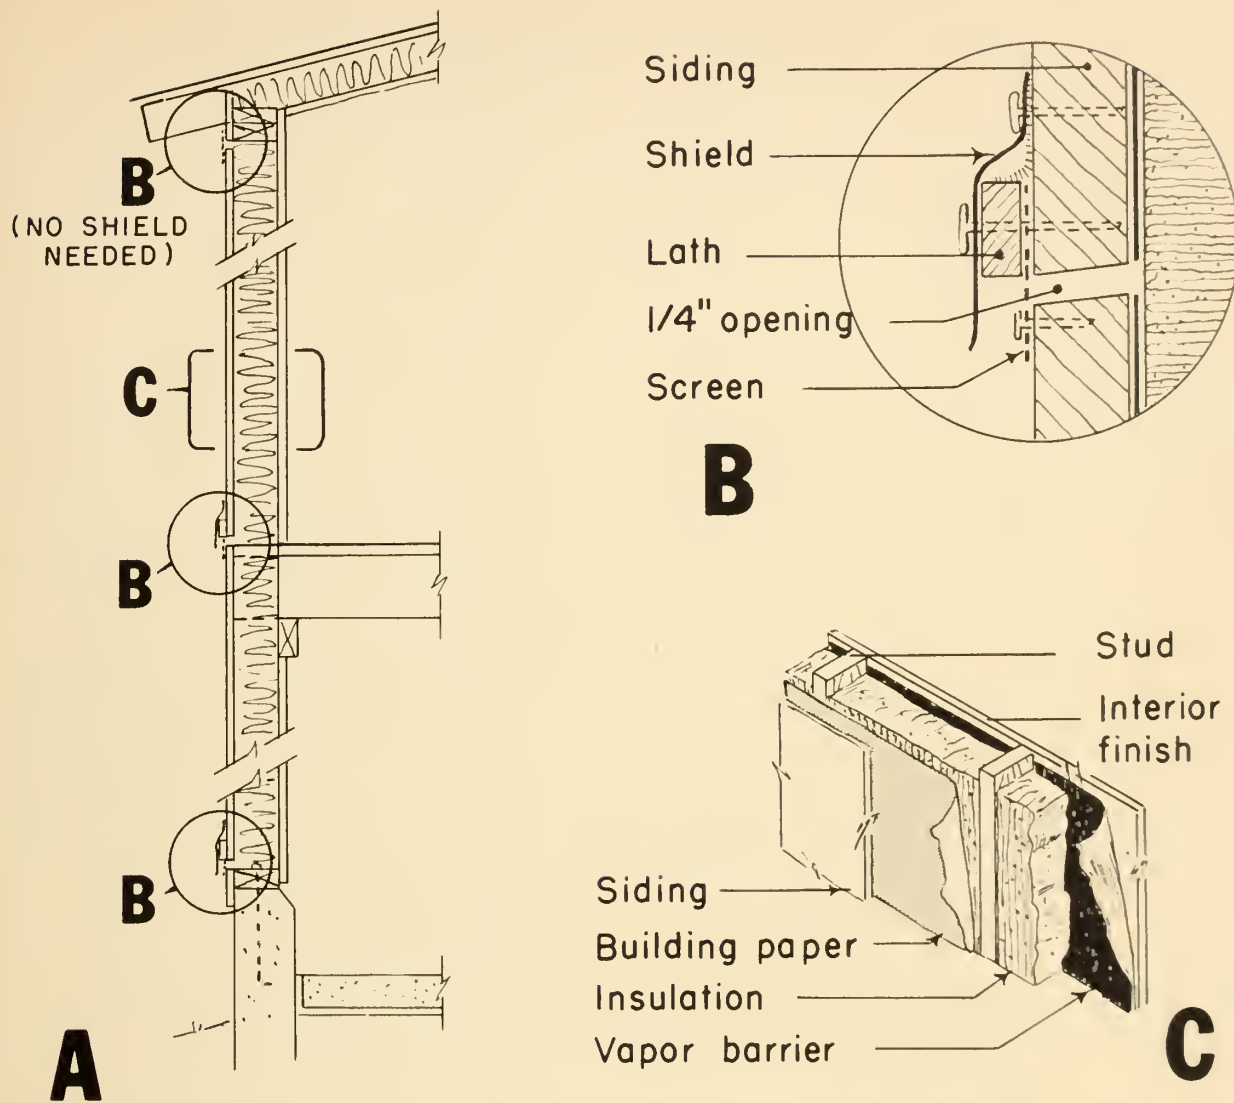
Installation of insulation and vapor barrier: A, Ventilation to the stud spaces by means of small screened openings or slots; B, detail of small vent; C, correct placement of material in insulated frame wall.
